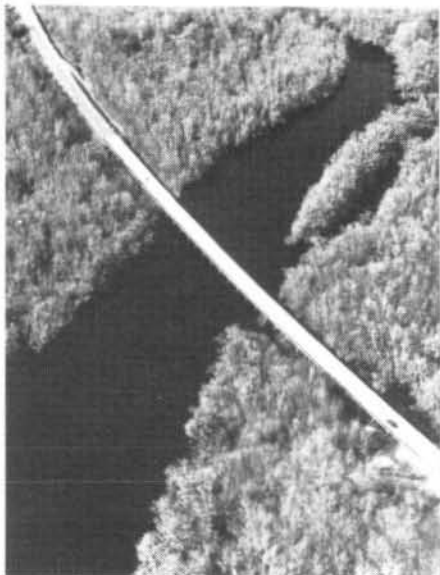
S. C. 917 HIGHWAY BRIDGE (R.M. 51.8)
